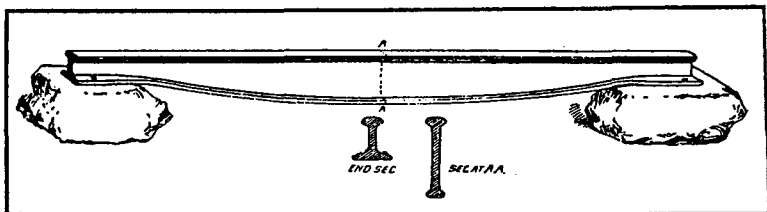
Edge rail, made of cast iron in 6-foot sections, for use with flanged wheels.
